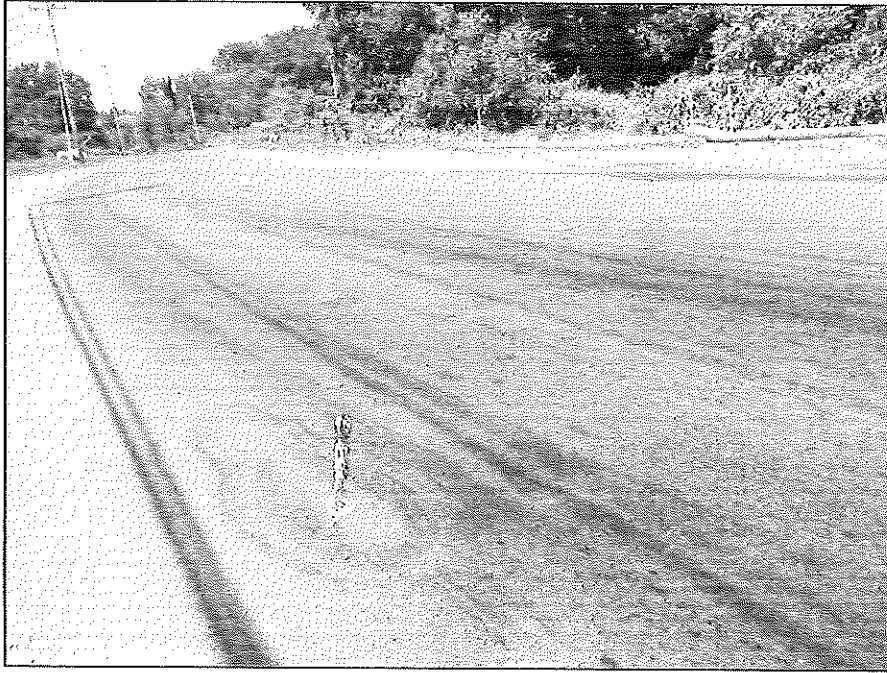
Wheeler Street looking southeast at Lowell Blvd
